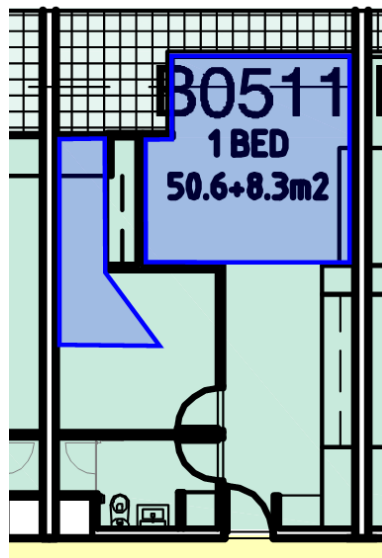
NATURAL VENTILATION ZONES AND OPENINGS – TYPICAL 1 BED APARTMENT
